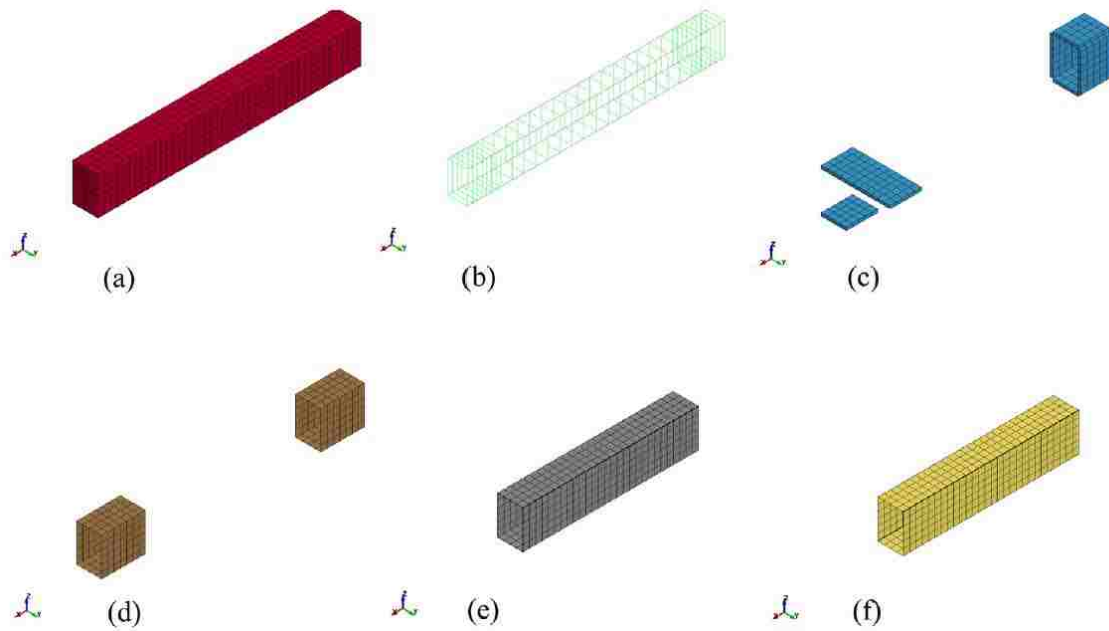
Modeled components: a) concrete beam, b) internal steel reinforcement, c) steel plates and loading arm, d) carbon fiber, e) cementitious matrix, f) PBO fiber.
